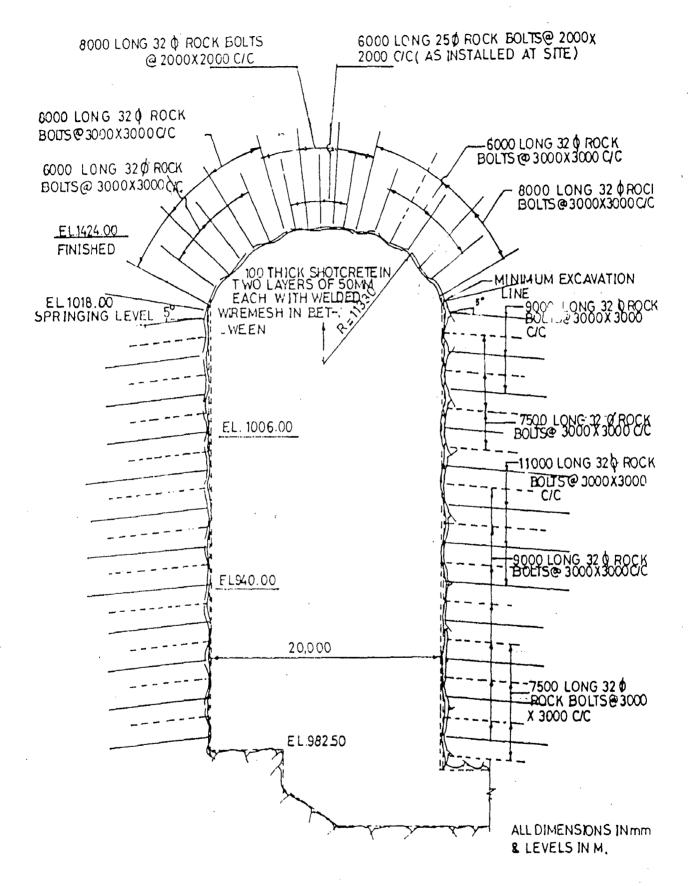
ROCK SUPPORTS ADOPTED IN NATHPA JHAKRI POWER HOUSE
